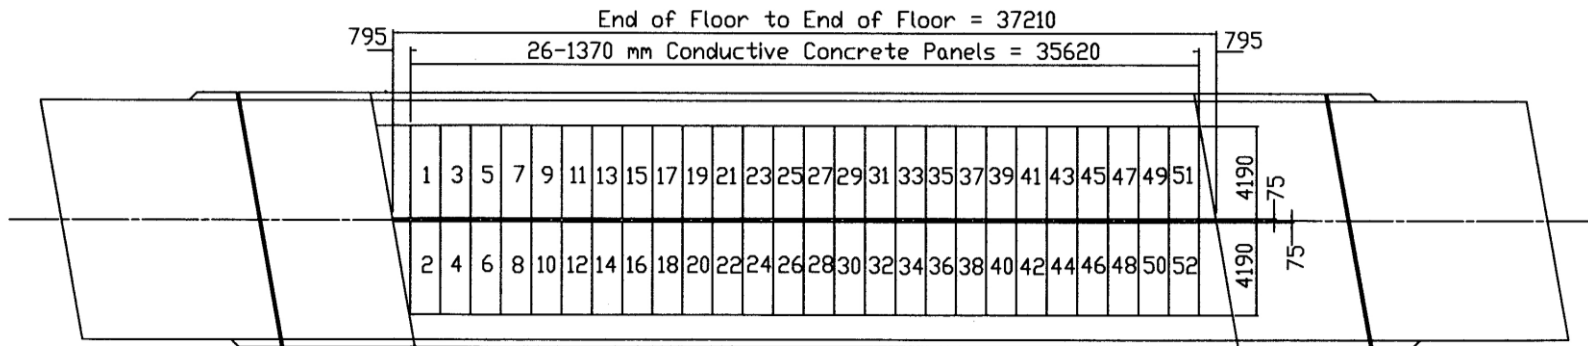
CONDUCTIVE CONCRETE PANEL LAYOUT
